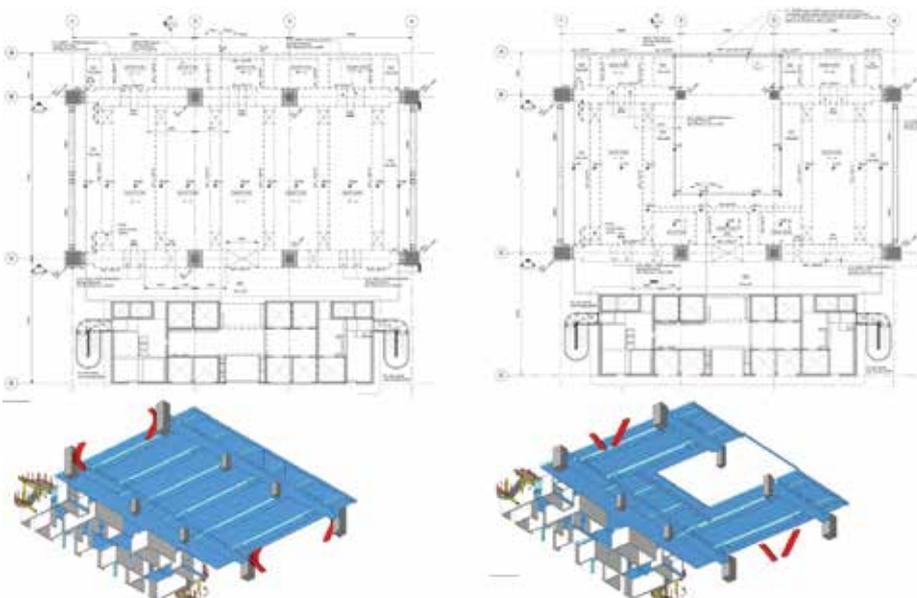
Typical floor structure. Full floor (left) and village floor (right). 3D views from below under (Source: Arup)
